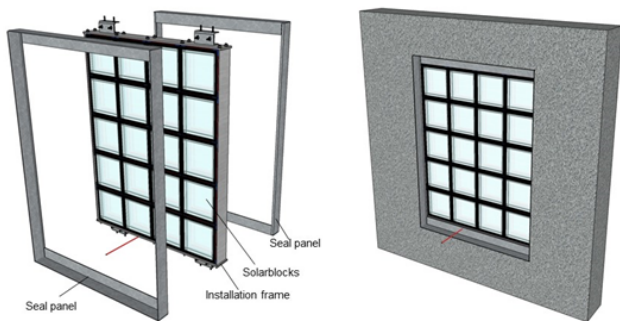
SBskin's solar glass blocks installation parts and integration into the building wall
